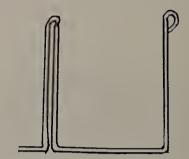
Illustrates the form to which the hightensile wire is adapted.
